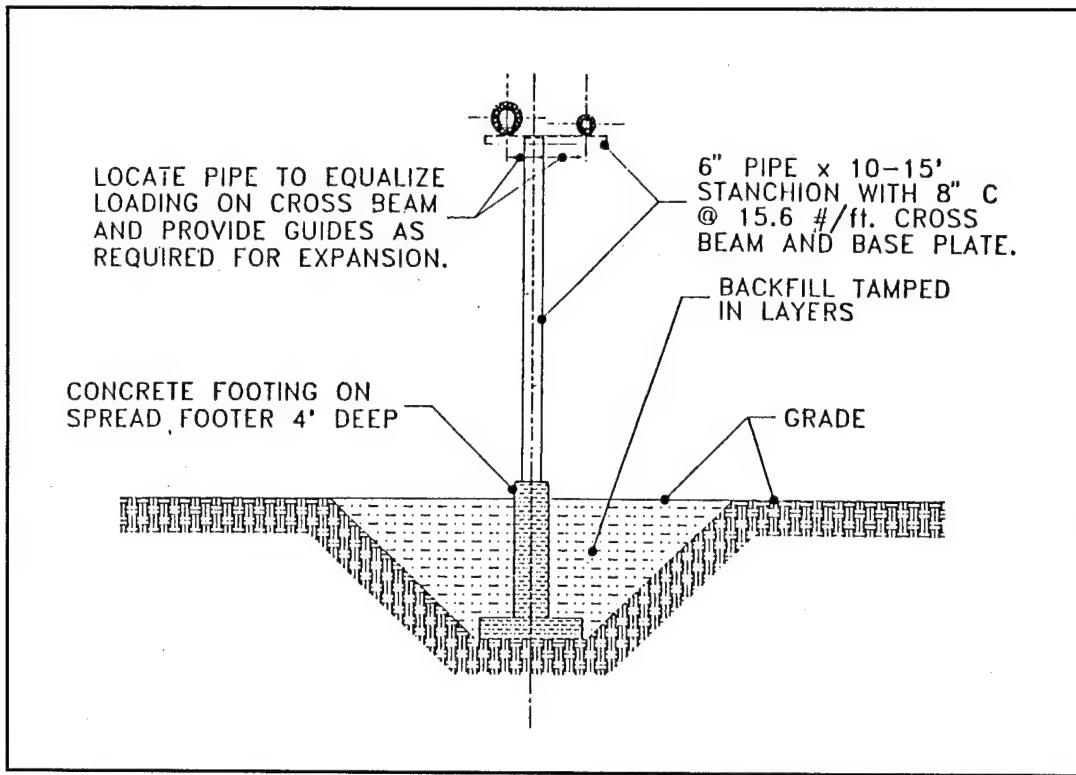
Steam distribution system design using aboveground single-stanchion construction.
